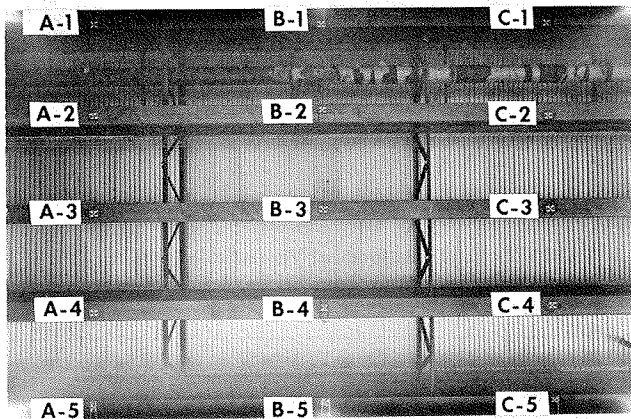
Fifth Street Bridge after pouring of concrete deck.
